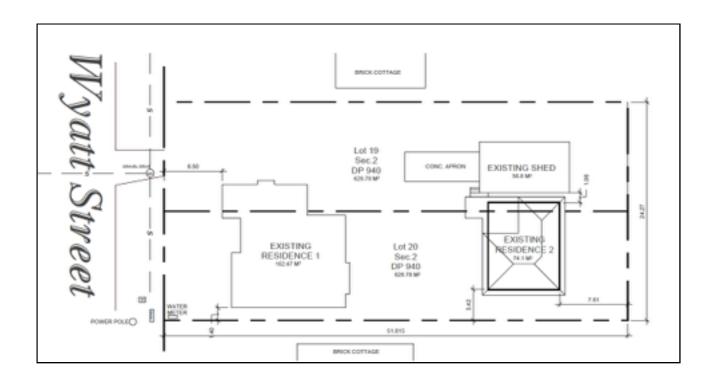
Site plan submitted with this proposal showing relationship between both dwellings
